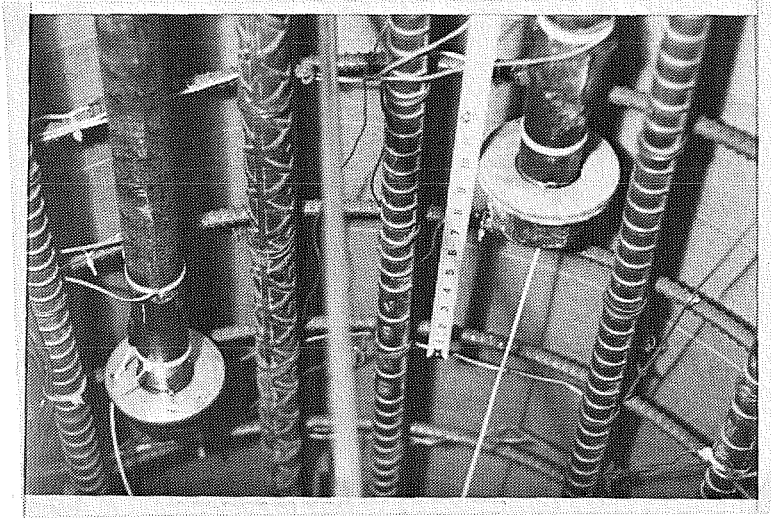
Bolts inside formwork – tests STG1 and SC7
